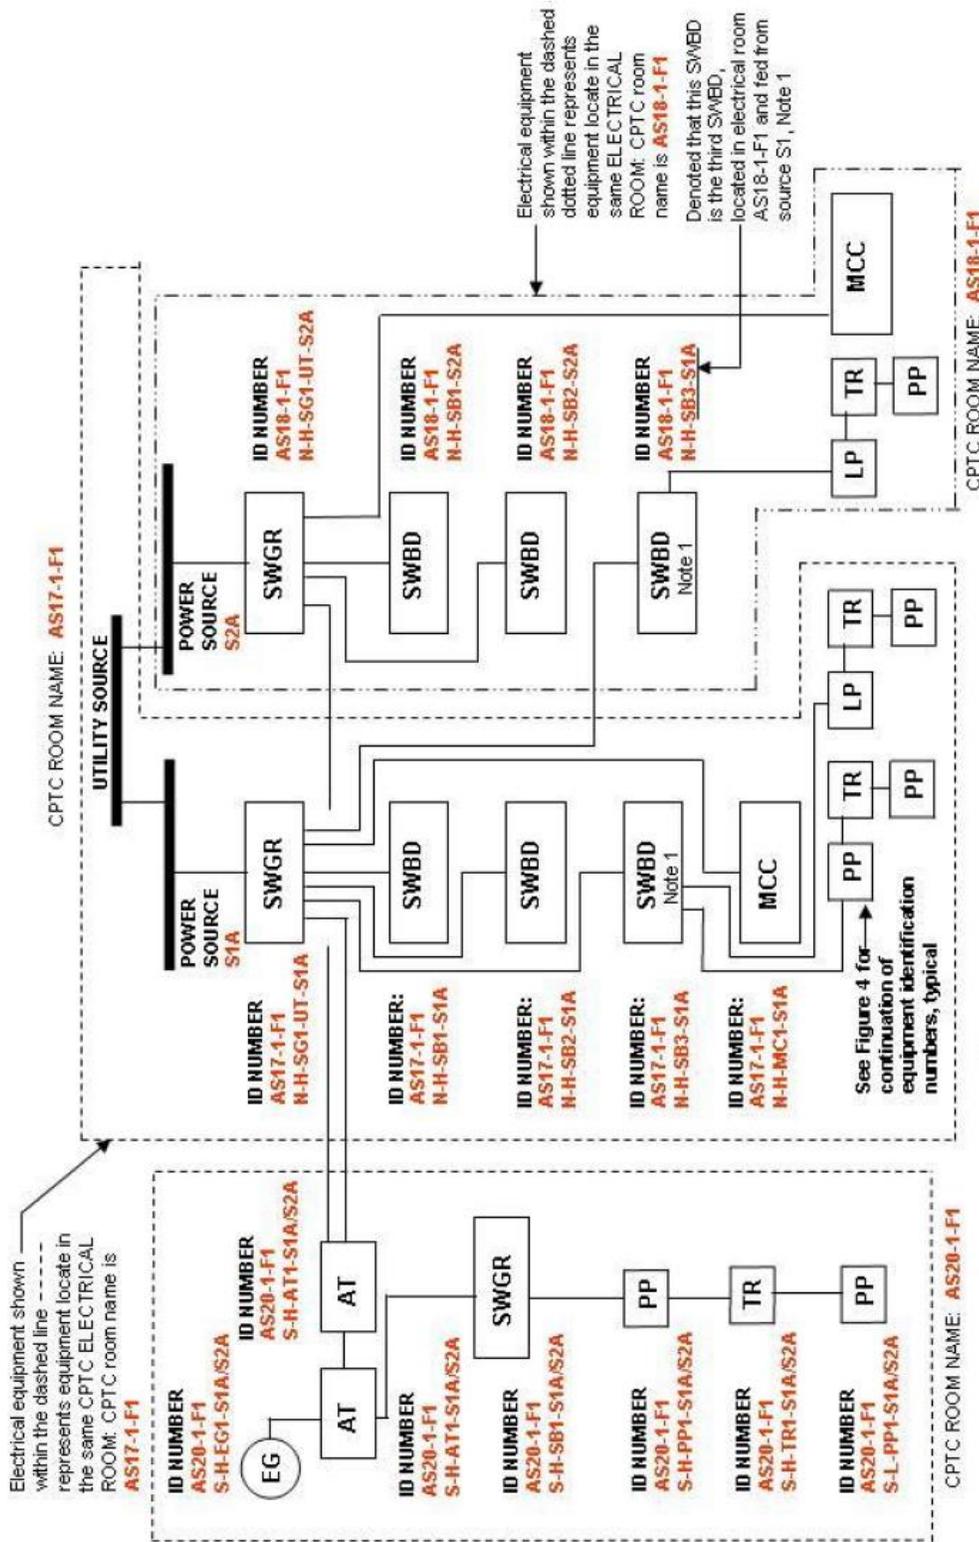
Electrical Equipment Room Layout Riser Diagram
